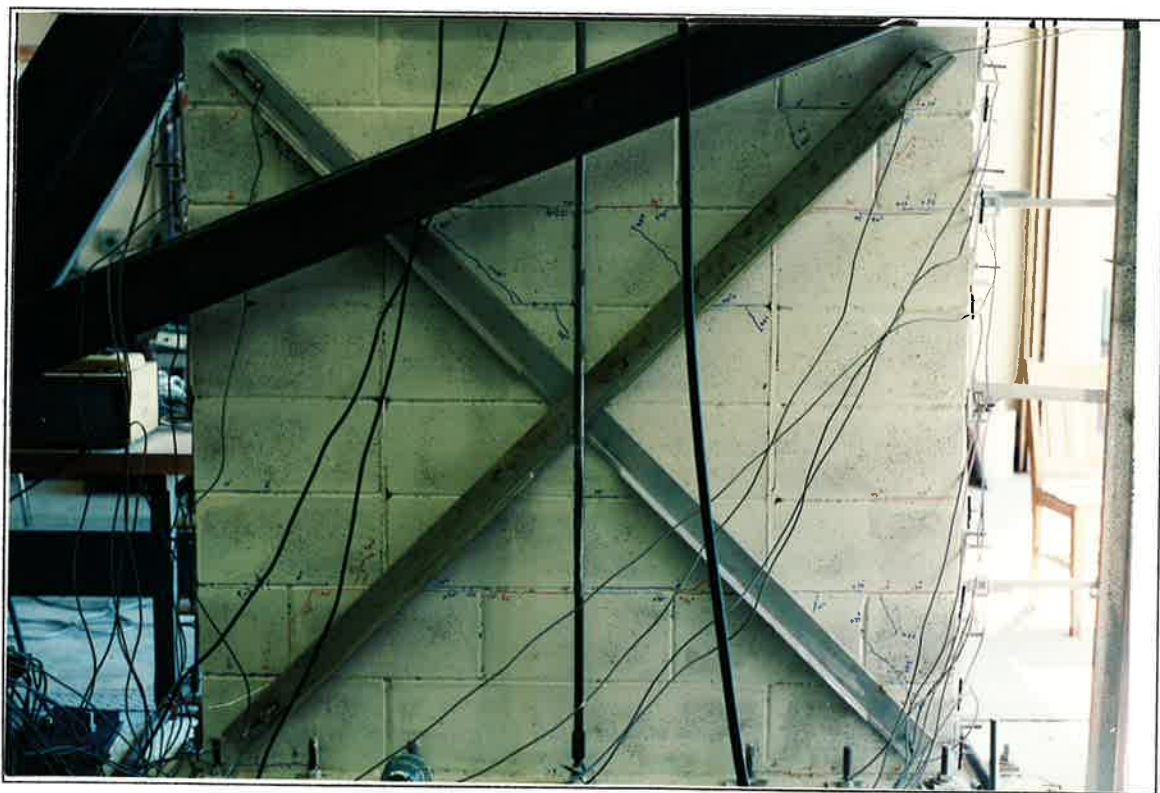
Slitted Wall North Face At 200 kN (45 Kips) Lateral Load
